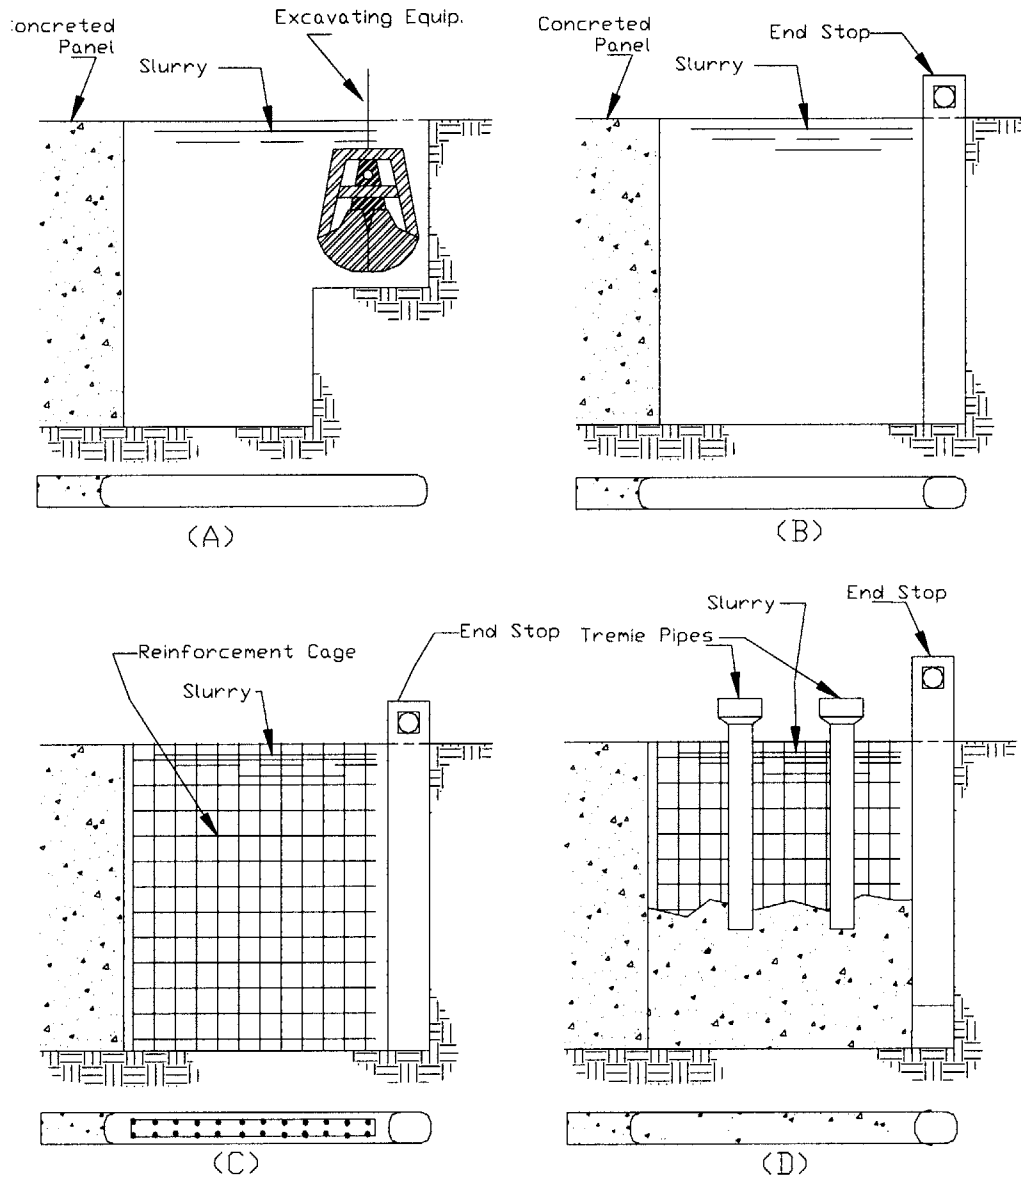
Typical Construction Sequence of Slurry Walls (Konstantakos, 2000)
